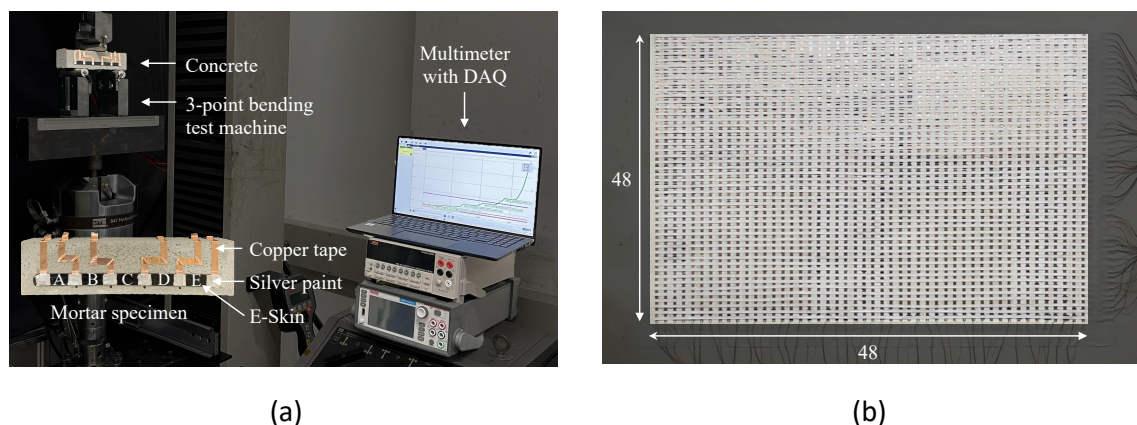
(a) 3-point bending test machine and multimeter with DAQ for crack detection test, (b) E-Skin coated wall load detection sensor
